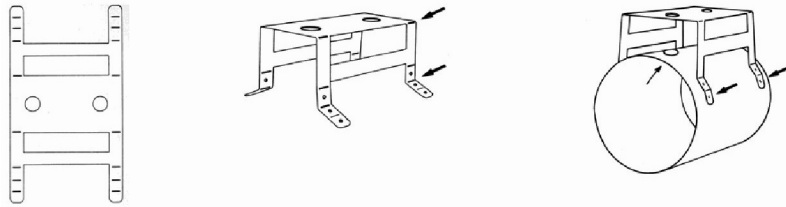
Mounting kit for insulated and circular air duct systems Rubber grommet
